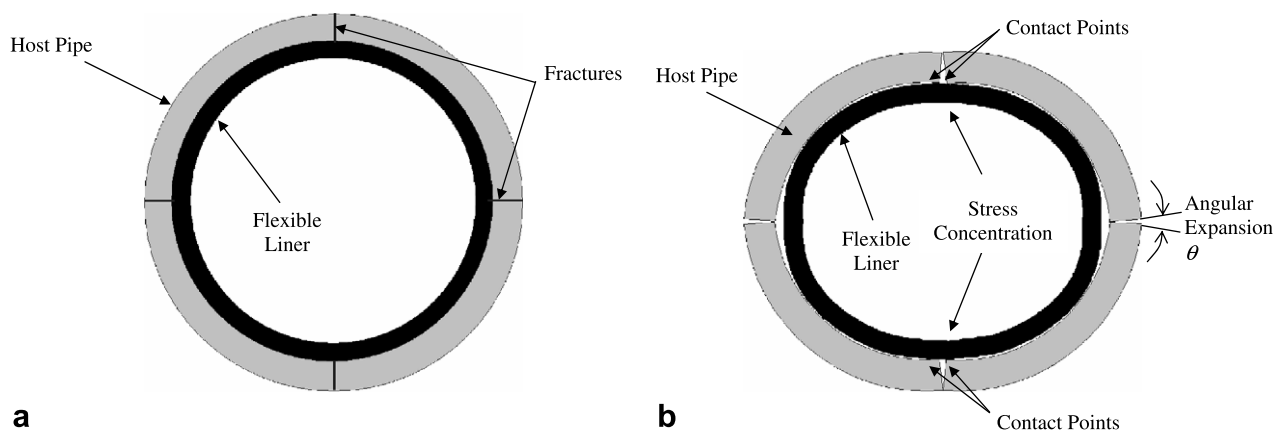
Host pipe–liner system. (a) Undeformed and (b) Deformed.
